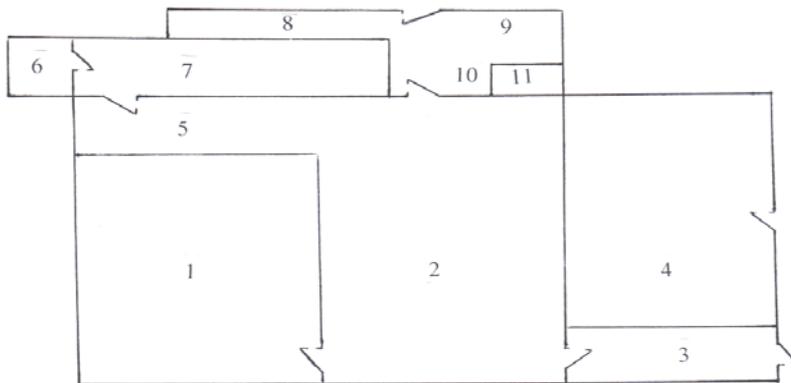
Layout of garden workshop containing in school building (1- bright room with windows; 2- dark room, drying room; 3- vestibule I; 4- laundry; 5- small laboratory; 6- cold basement; 7- technical equipment, tool room; 8- big tools; 9 – vestibule II; 10- cloak room; 11- chimney [*cold room – basement*: a storeroom for keeping garden plants wintering in low temperatures in the basement, seeds, bulbs, rootstocks; small garden tools; crop protection chemicals, fertilizers; paints, solvent; small gardening accessories; *bright room with windows*: garden and pot plants’ reproduction; storeroom for plant pots, vases and Ikebanas; colorful photos – plant classification; classes with children adequate to the room function; *dark room – drying room*: storeroom for drying and storing plants for dry arrangements; exhibition room for plant display; classes with children adequate to the room function; *small laboratory*: plant preparation in higher temperatures strengthening colors in glycerine for dry arrangements, carried out on a gas stove; soil roasting in high temperature in order to decontaminate it from spores of fungal diseases, bacteria and removing seed from weeds (so prepared soil is used to grow healthy seedling of plants from seeds sowed in window boxes); accessories, containers for flower arrangements; sink; *vestibule I*: storeroom for dried plants; drying room for dry flower arrangements; *vestibule II*: tools for direct work in the soil – big rakes, spades, forks, hoes, etc.; garden hose; window boxes, buckets and other gardening containers; grinders for sharpening garden tools; cloakroom for a gardener – hangers, shelves and closets; *laundry*: washing a dirty clothes after gardening; washing, shower after gardening; washing of school personnel’s clothes].
